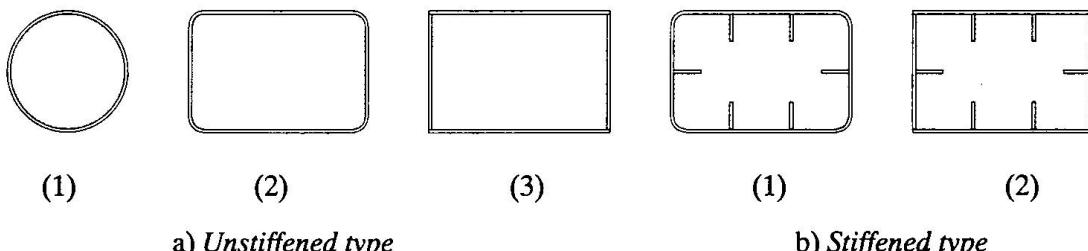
Typical cross sections of concrete filled steel tubular columns.
